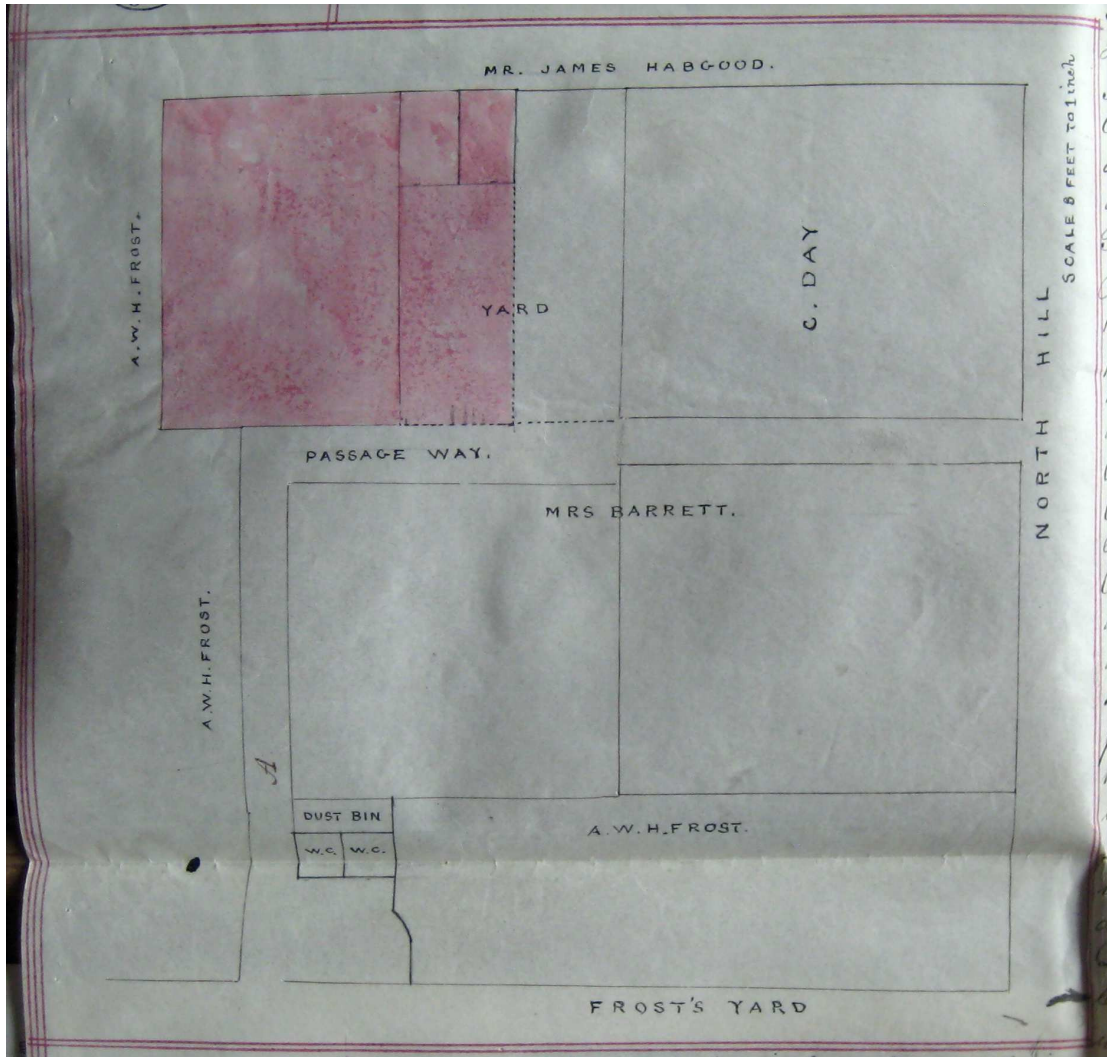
Plan included in an indenture drawn up in 1876 to record the sale by A W H Frost to Charles Day of the building which was to become Day's Warehouse (coloured pink on the plan along with half the open yard between it and Day's house (Nos 49 and 50) on the right).
